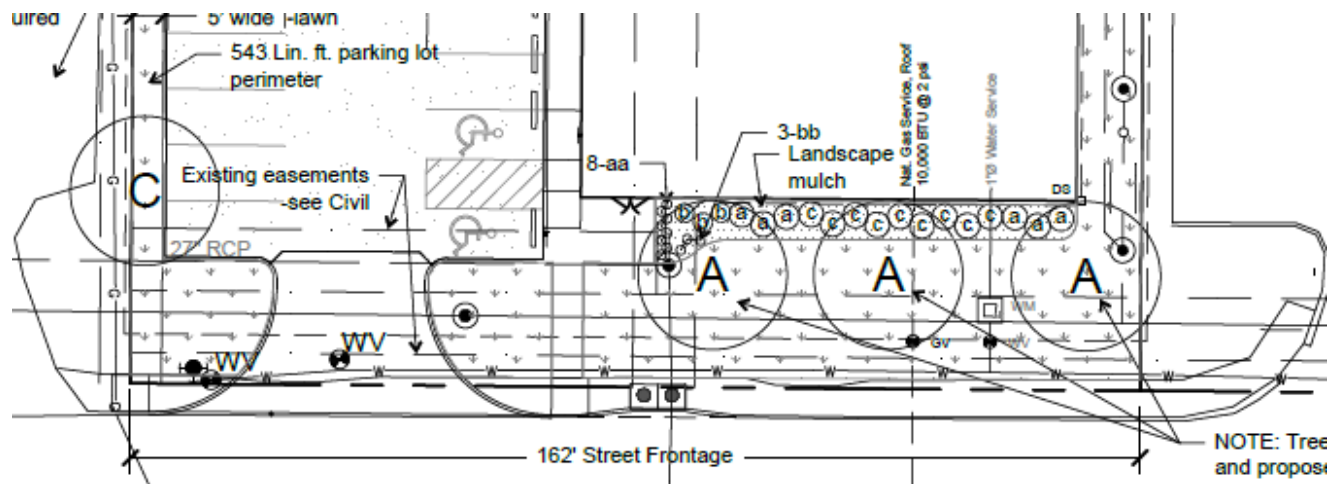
Close-up of Landscape Plan along Baur Boulevard.
